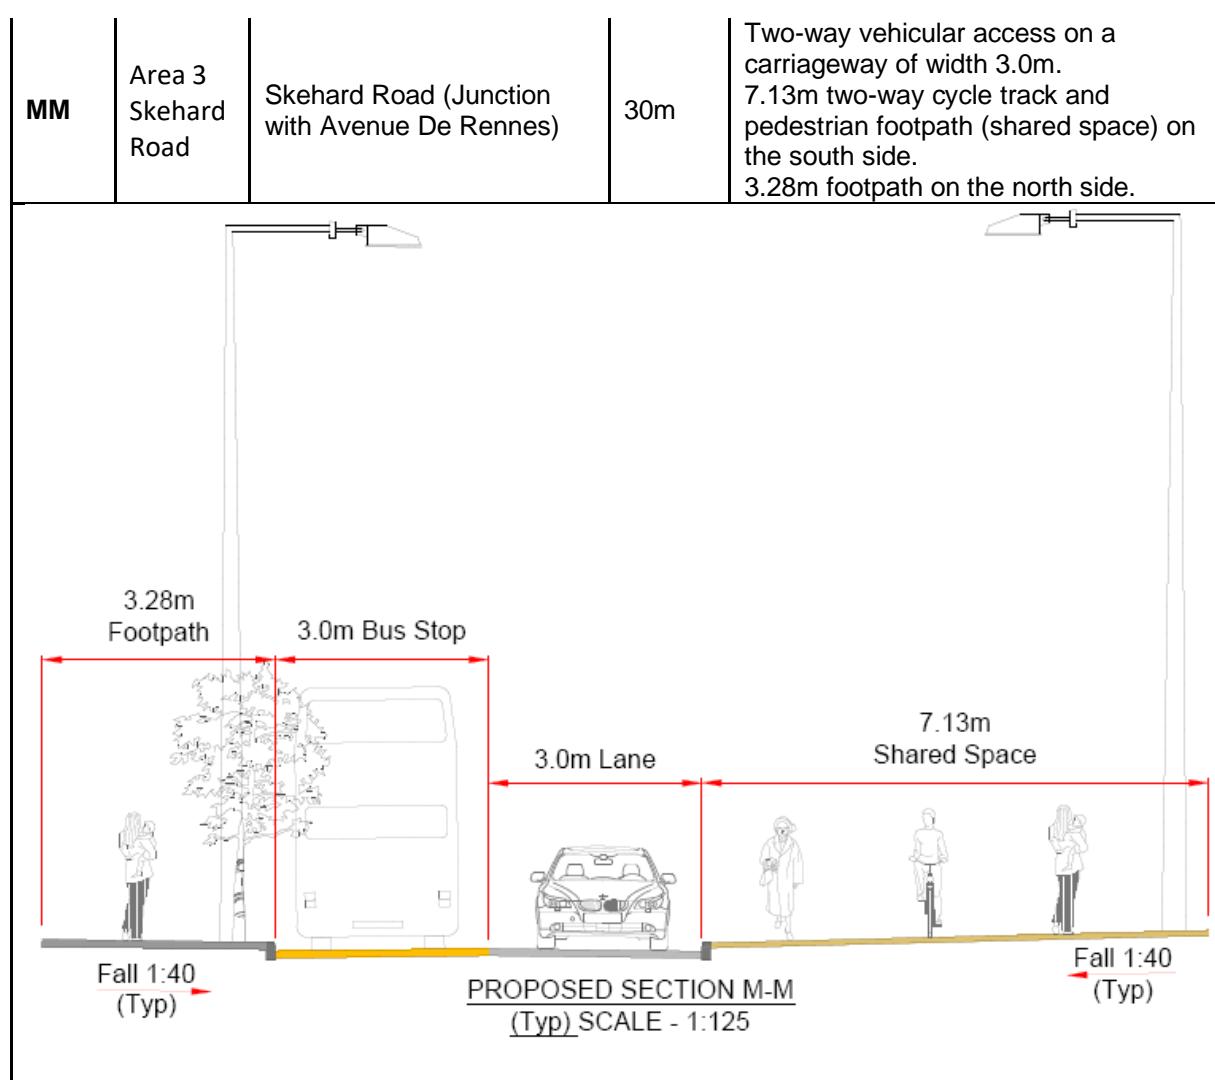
Cross Section Locations - Area 3: Skehard Road
